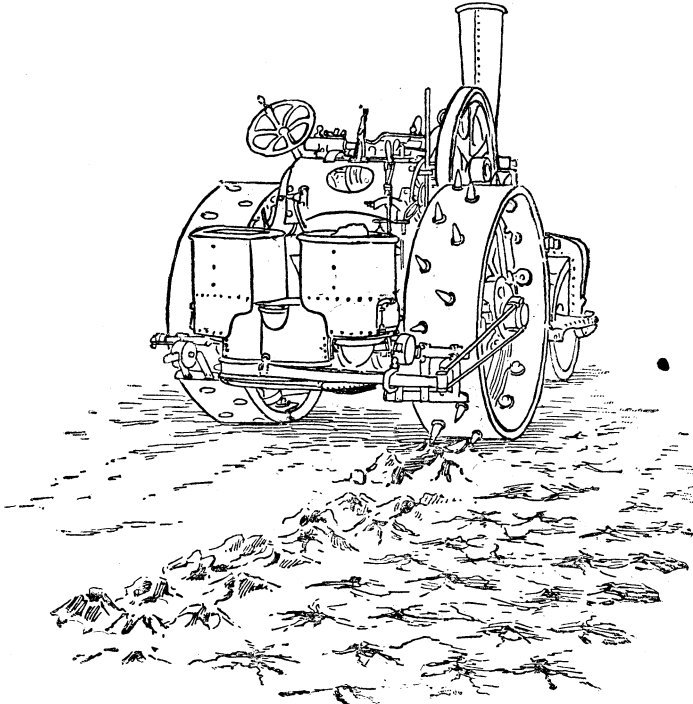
Steam roller with spikes in wheel breaking up road surface.
